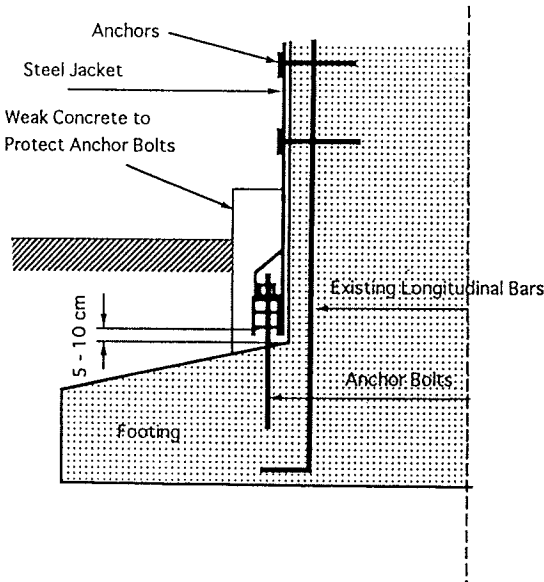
Seismic Strengthening of Reinforced Concrete Piers by Steel Jacket with Controlled Increase of Flexural Strength
